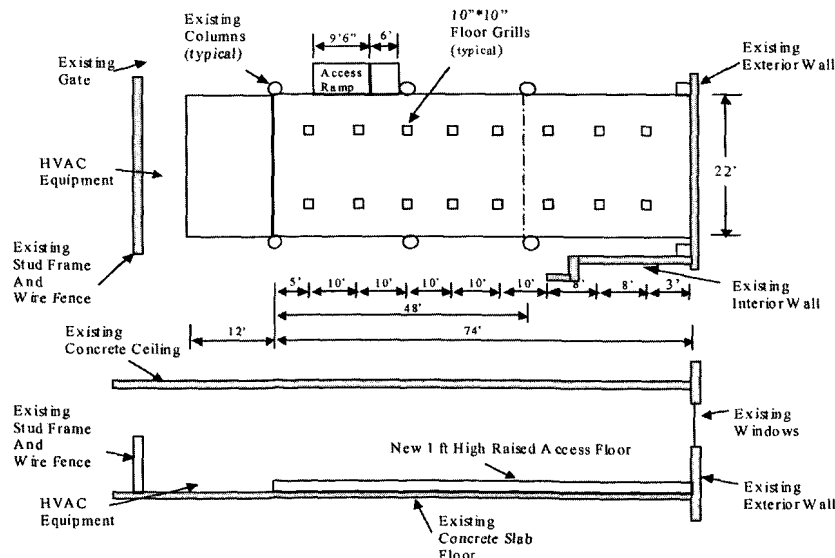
Plan and section views of underfloor air supply plenum test facility.
